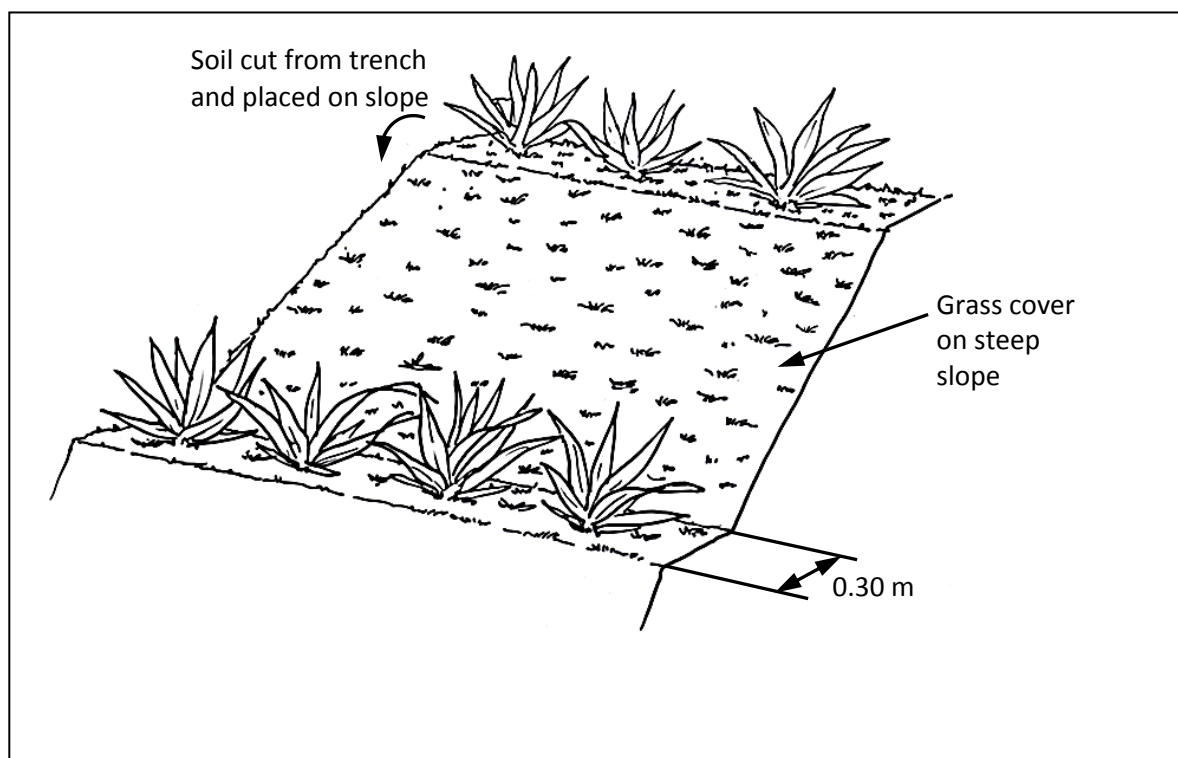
Modified Bench Terraces ($35\% < \text{slope} < 55\%$)
